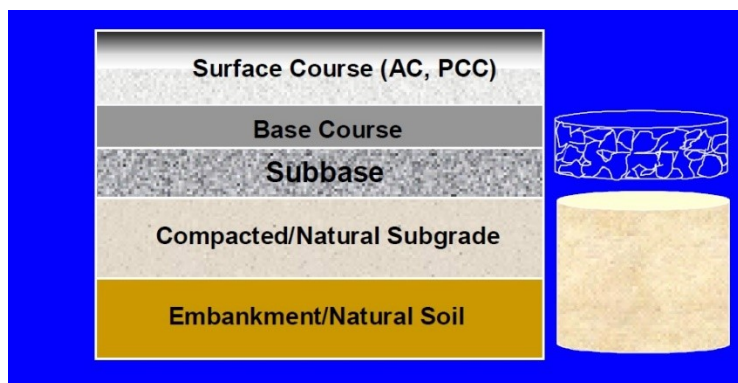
Basic component of a typical pavement system (FHWA 2006)
